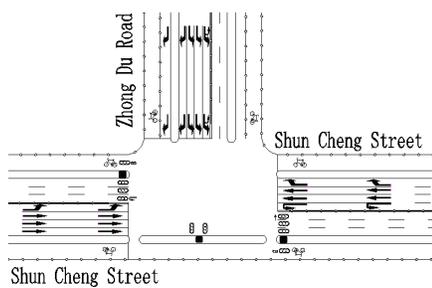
The T intersection of Zhong Du Road and Shun Cheng Street
